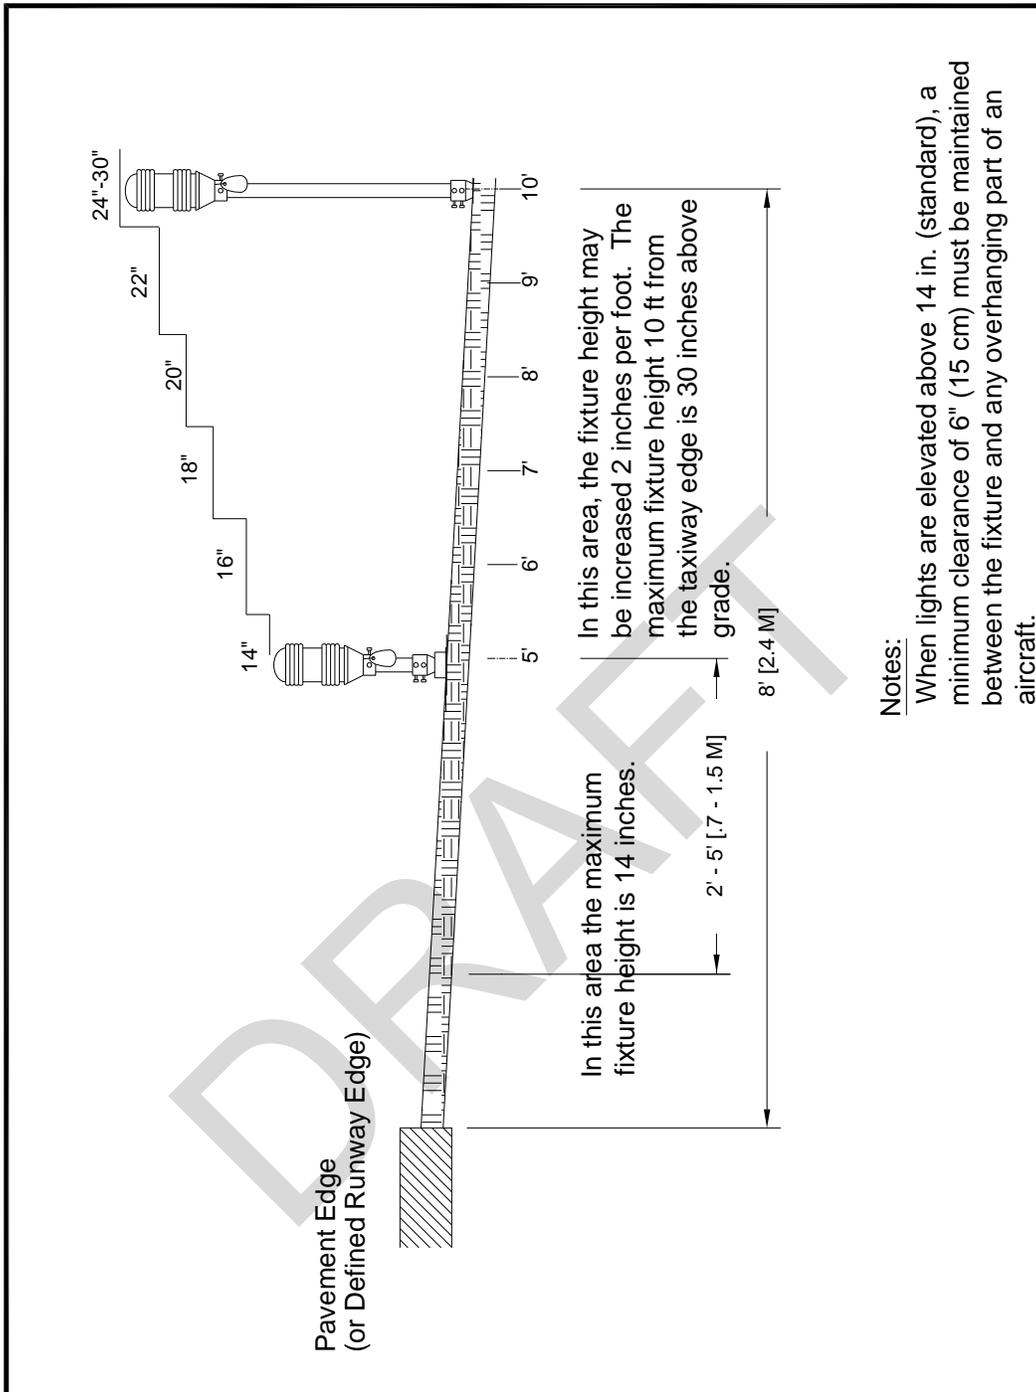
Adjustment of Edge Light Elevation for High Snowfall Areas.
